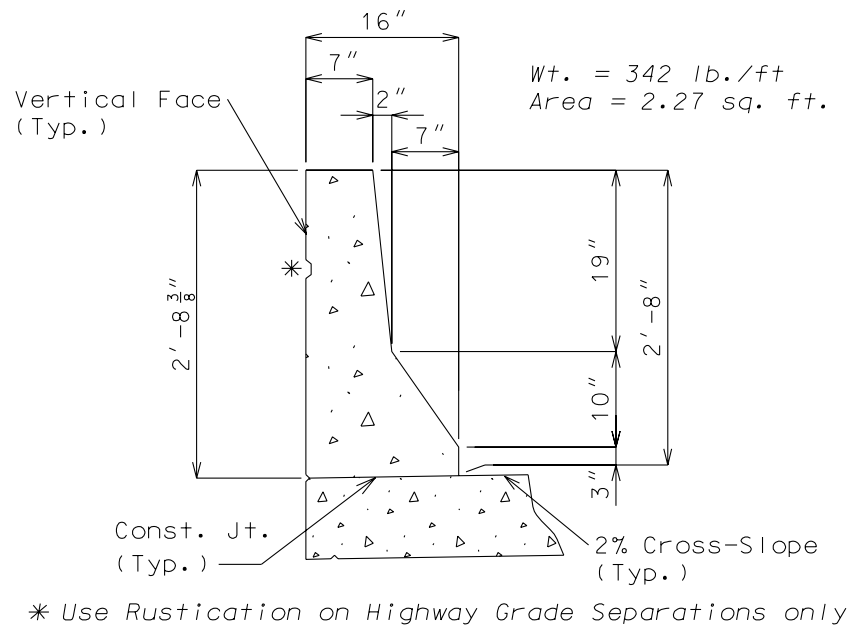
Safety Barrier Bridge Curb Dimensions
